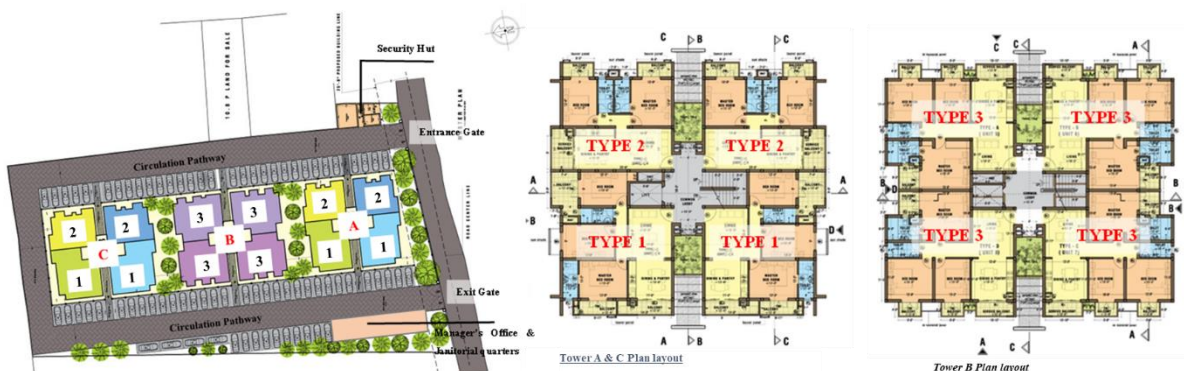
, Layout Plan & Tower Plans (Source: <https://www.primeresidencies.lk> & Author)
